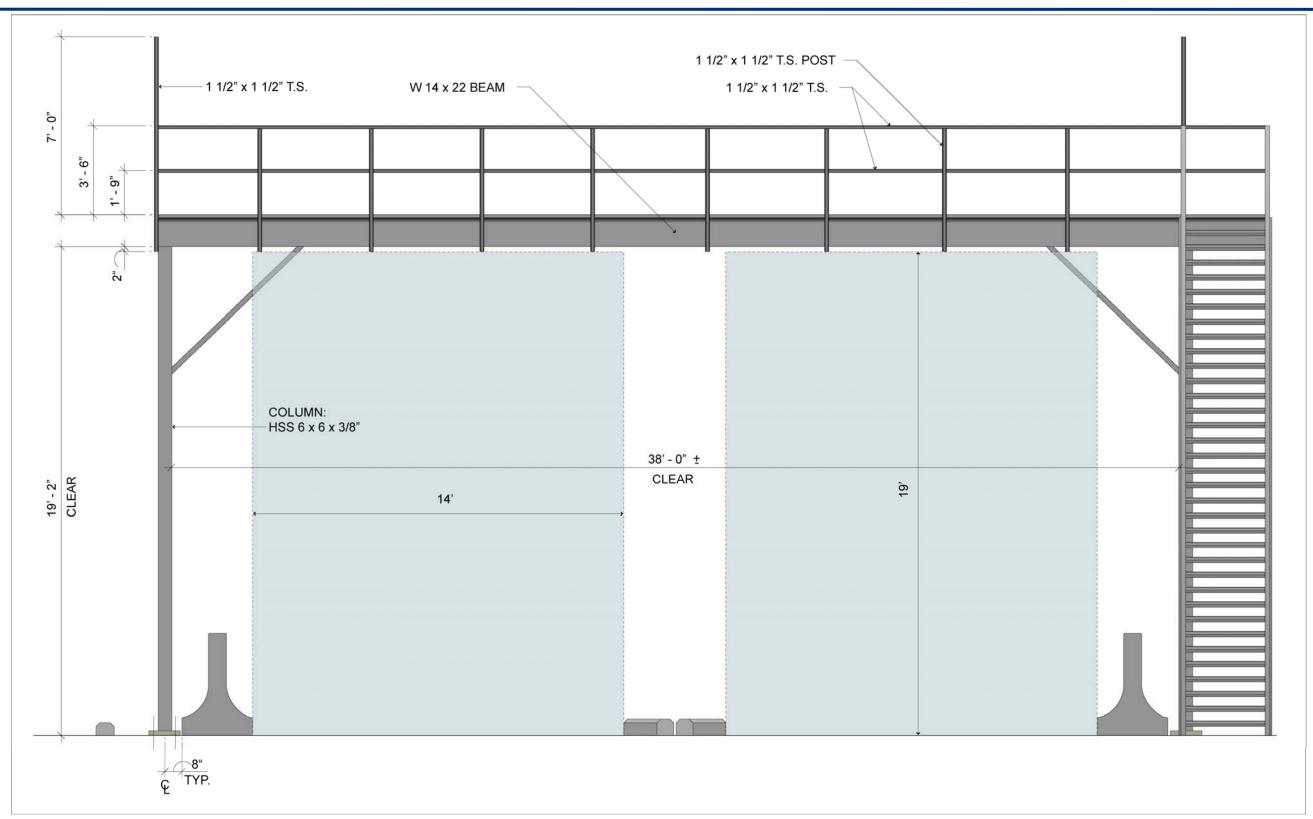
Detail of Overhead Structure - Elevation Looking East
